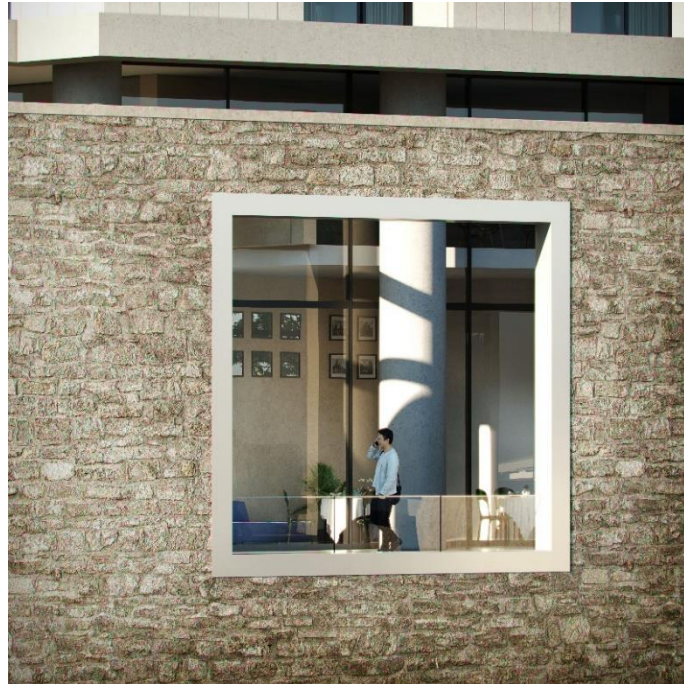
View of proposal showing restored Quay Wall with new opening and walkway behind
